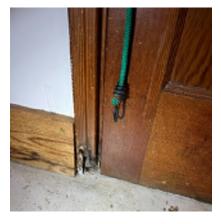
Bottom of the Door Frame Trim Is Rotten, Indicating Water Damage.
